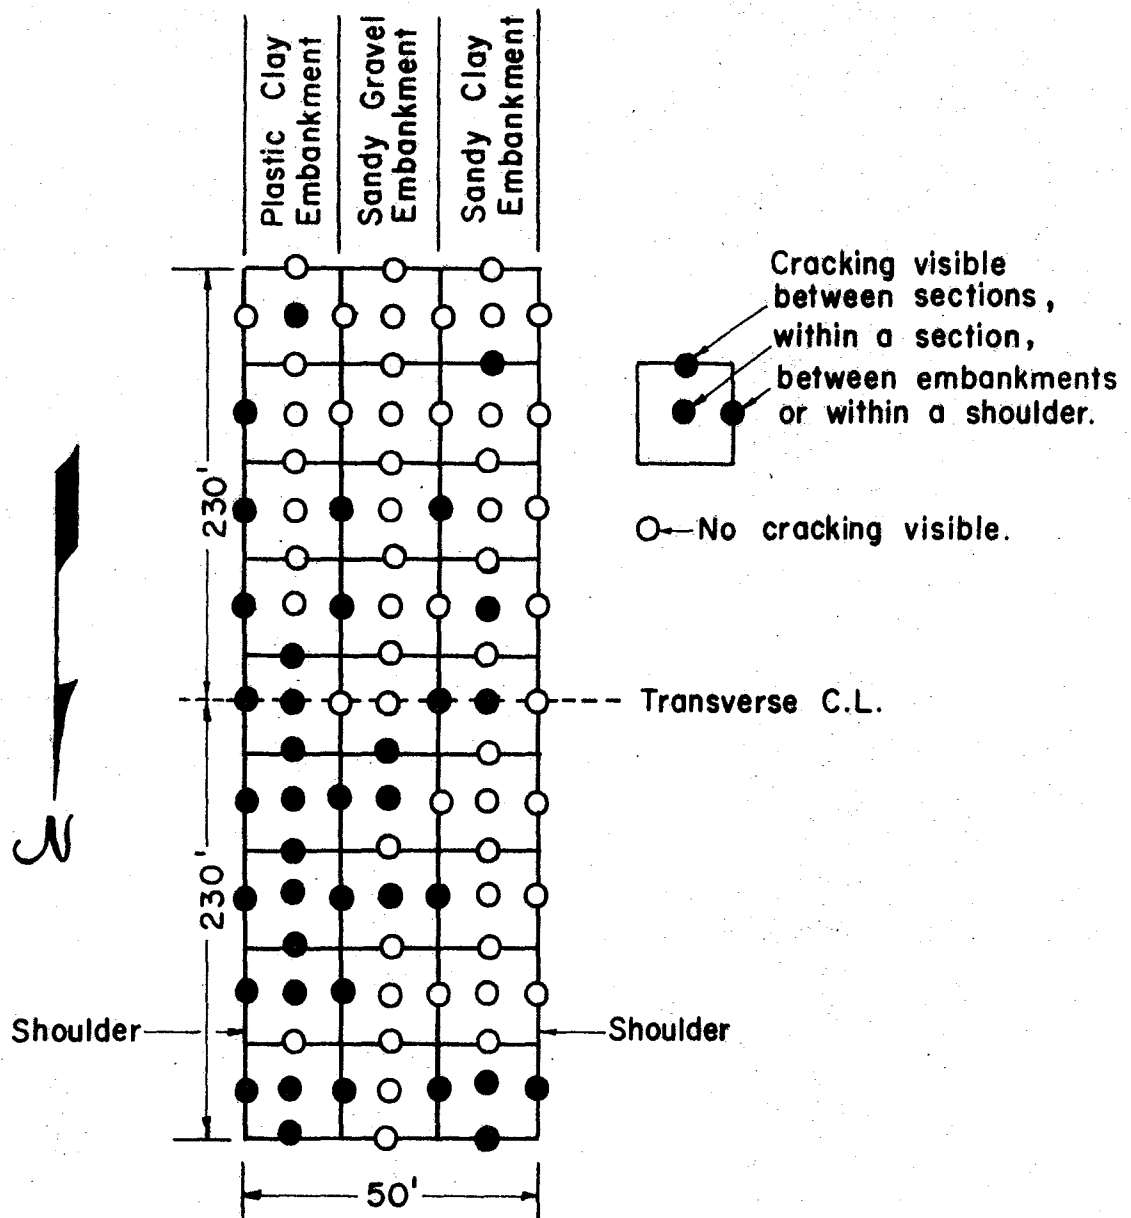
Schematic plan view of TTI Pavement Test Facility showing location of cracking.
